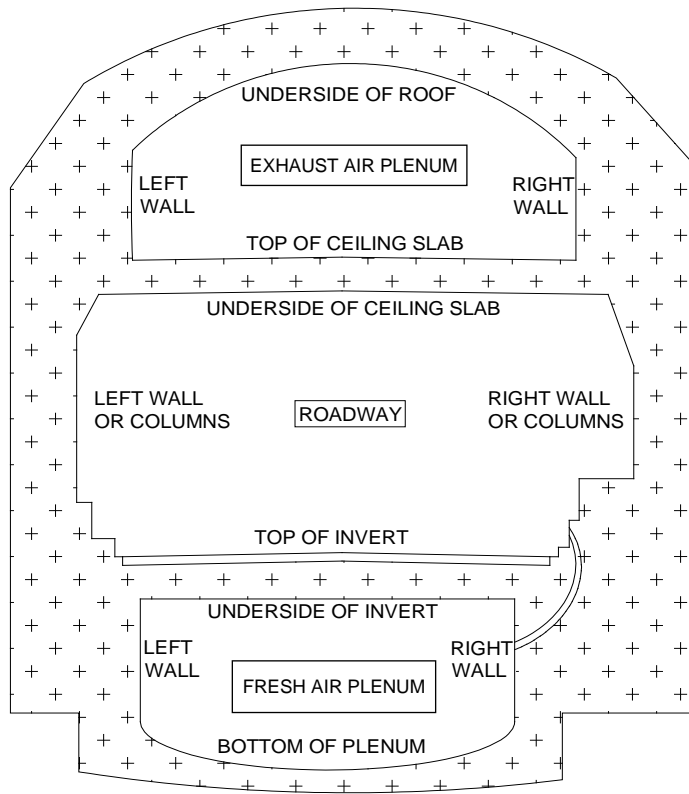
Sample labels used with horseshoe shaped tunnel.
